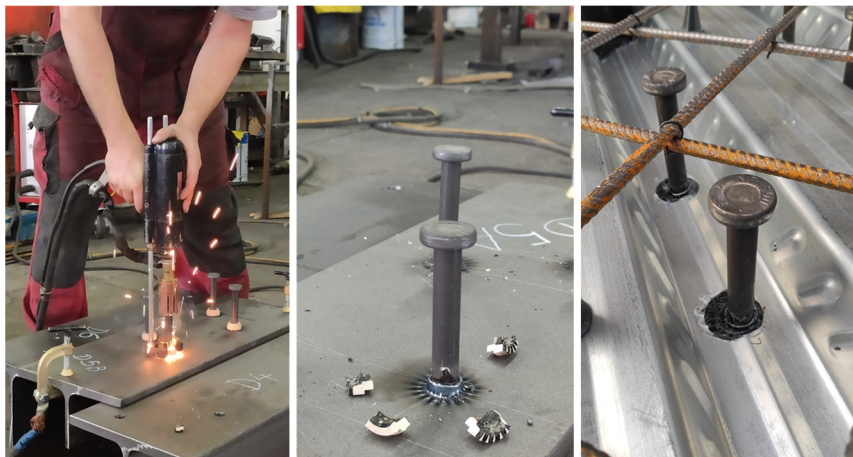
Headed studs during welding and placed in the profiled sheeting.
